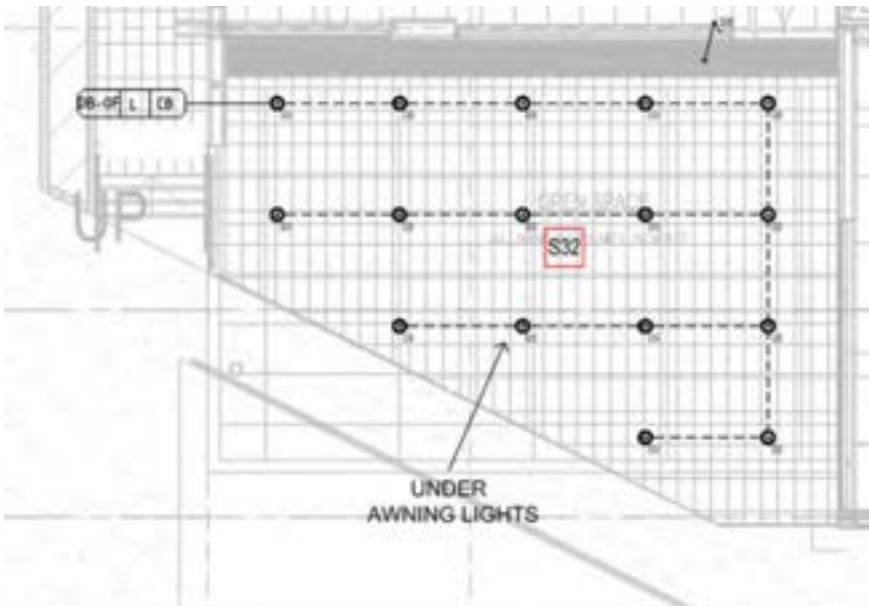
Warehouse 1 Employee Outdoor Meal Break Area Lighting Plan
